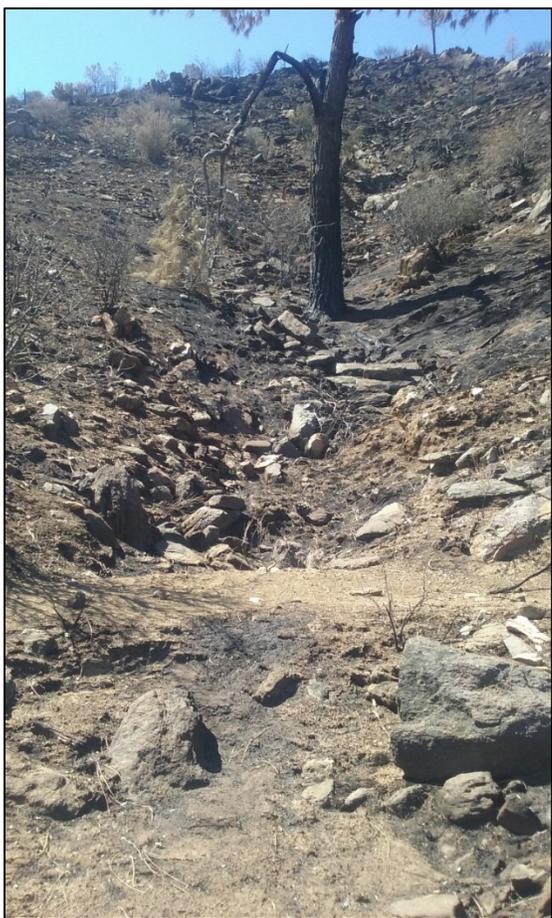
Long Canyon trail needs drainage dip constructed at crossing
